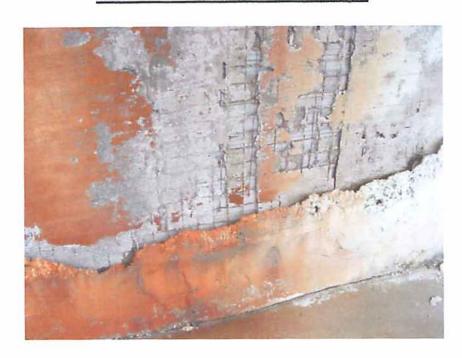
Structure #2238 - Typical Wall Covering - Wire Fabric Nailed to Wood Shingles Then Covered with Two Thin Layers of Cement.
